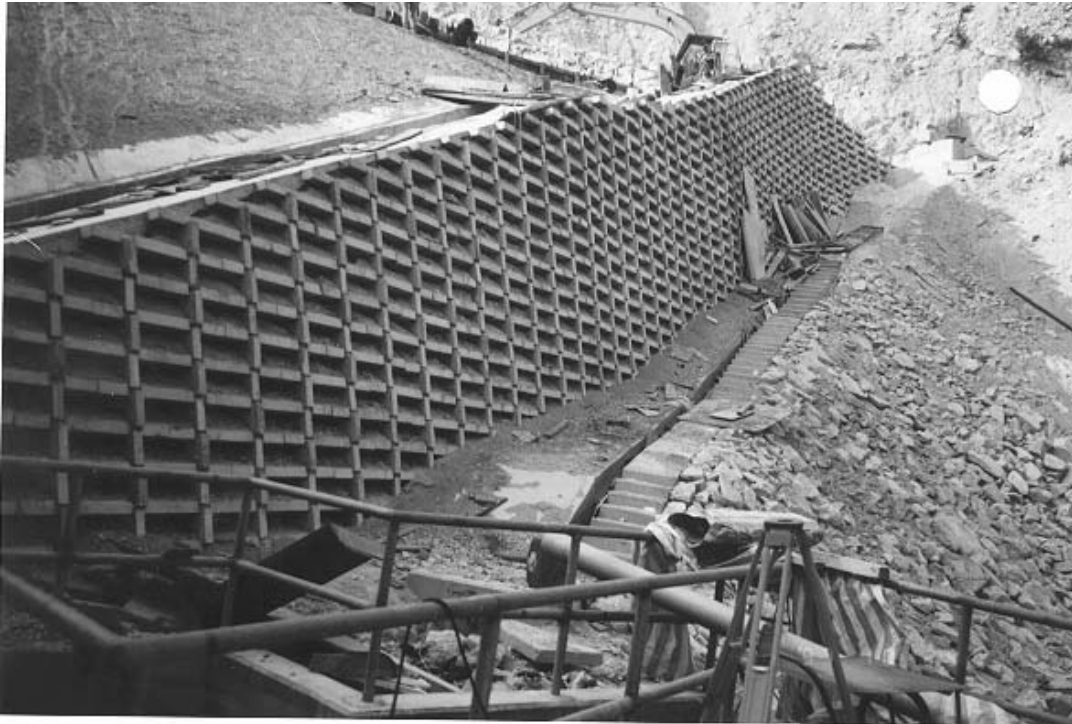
View North Along Completed Crib Wall From New Reservoir Structure
